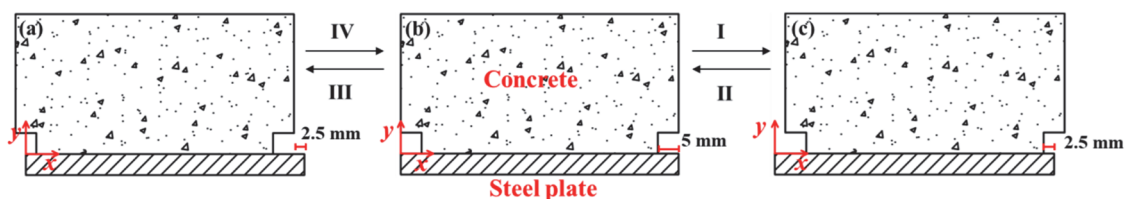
Cyclic shear path: (a) Shear displacement = -2.5 mm; (b) Initial position = 0 mm; (c) Shear displacement = +2.5 mm
